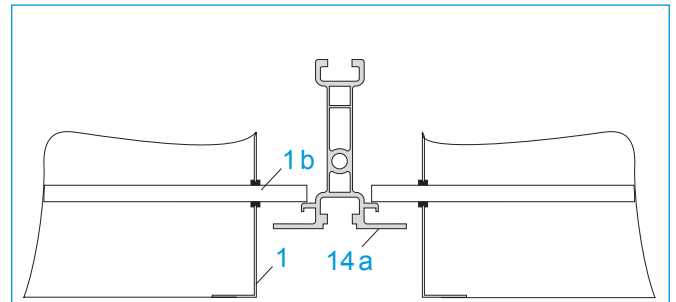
Installation step 1: FFU-housing with locking bolts 1b into the ceiling grid
